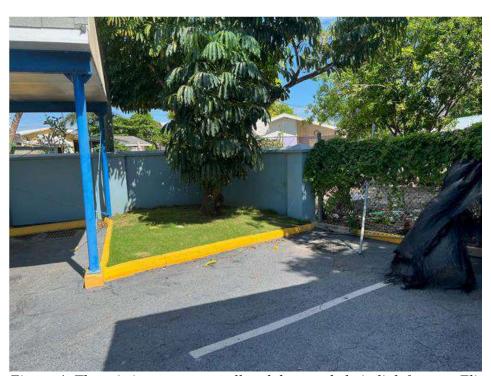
The existing concrete wall and damaged chain link fence at Elizabethan Square.
